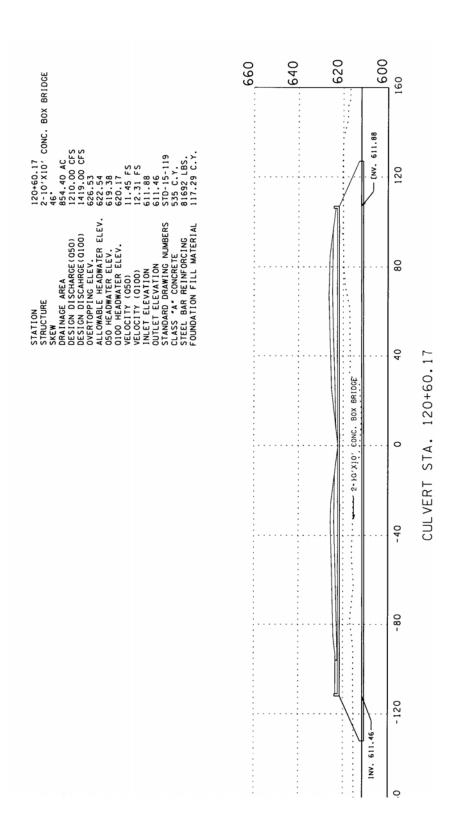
A-19. Portion of Culvert Sections Sheet (Box Bridge)
